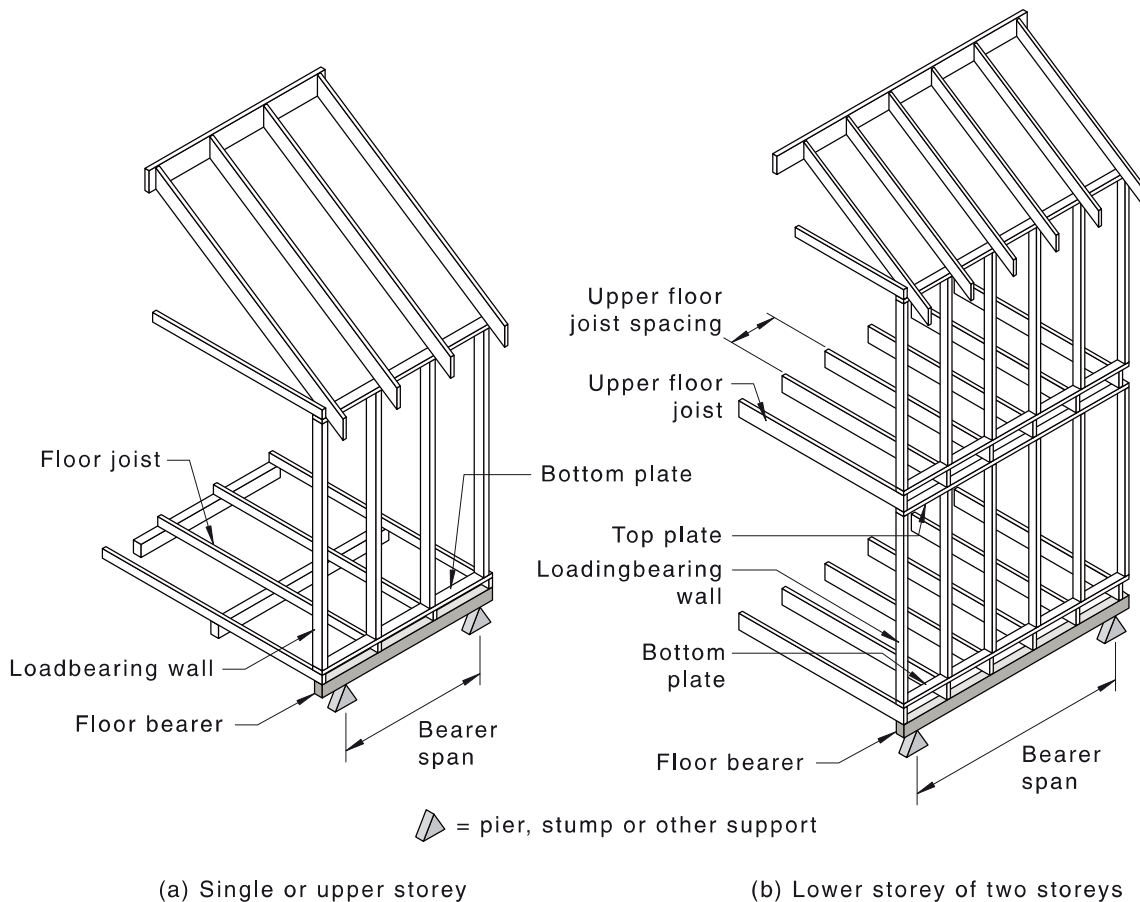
BEARER SUPPORTING LOADBEARING WALL
